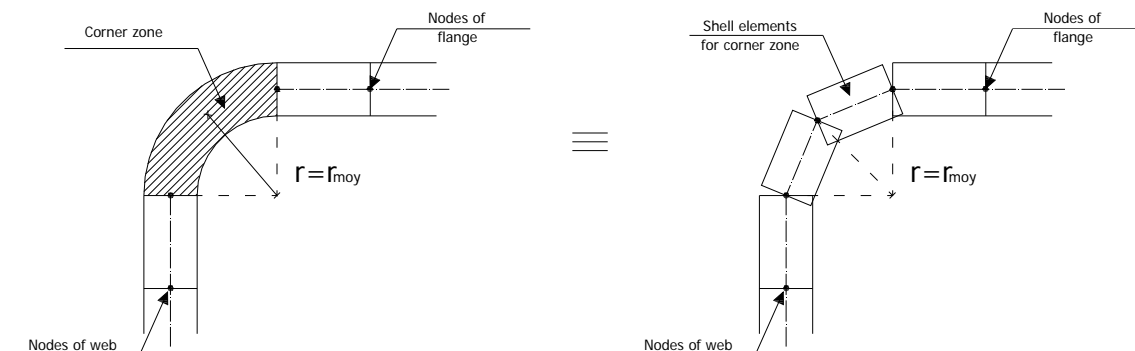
FEM-treatment of corners zones for hollow sections – a) beam models – b) shell models
